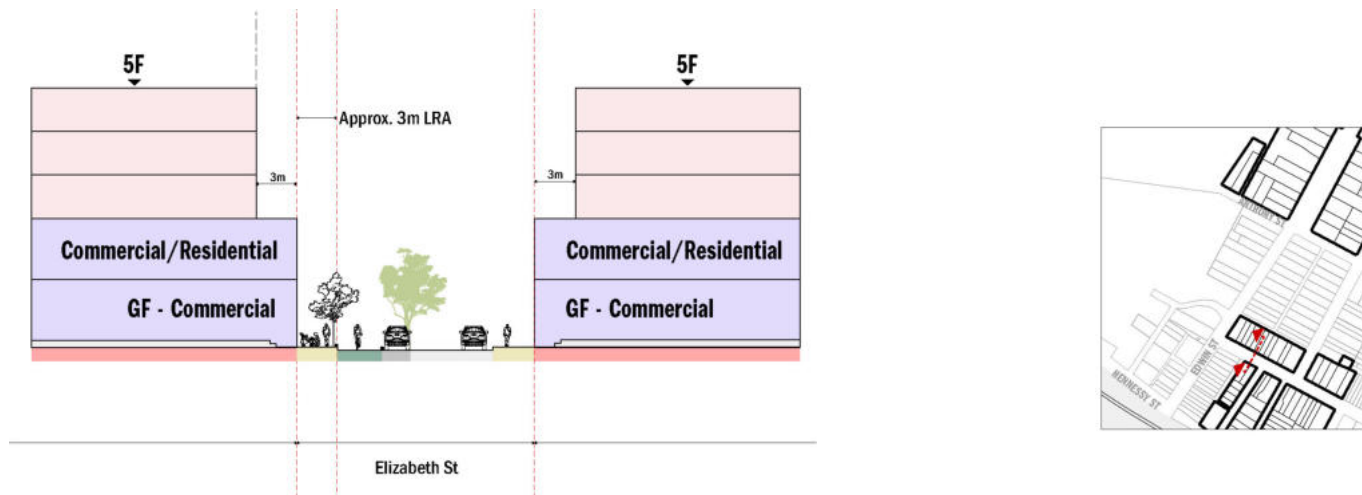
Croydon Centre North – Elizabeth Street west of Croydon Road Section
